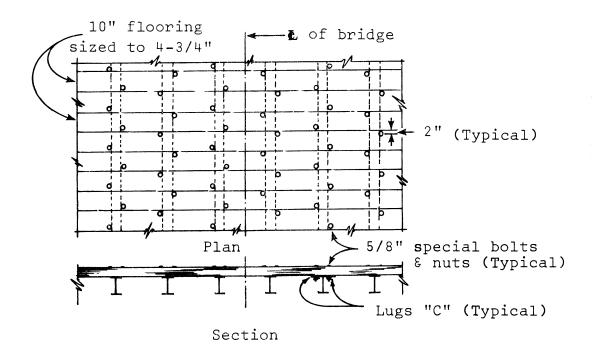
Partial plan and sectional view showing the floor fastener arrangement.
